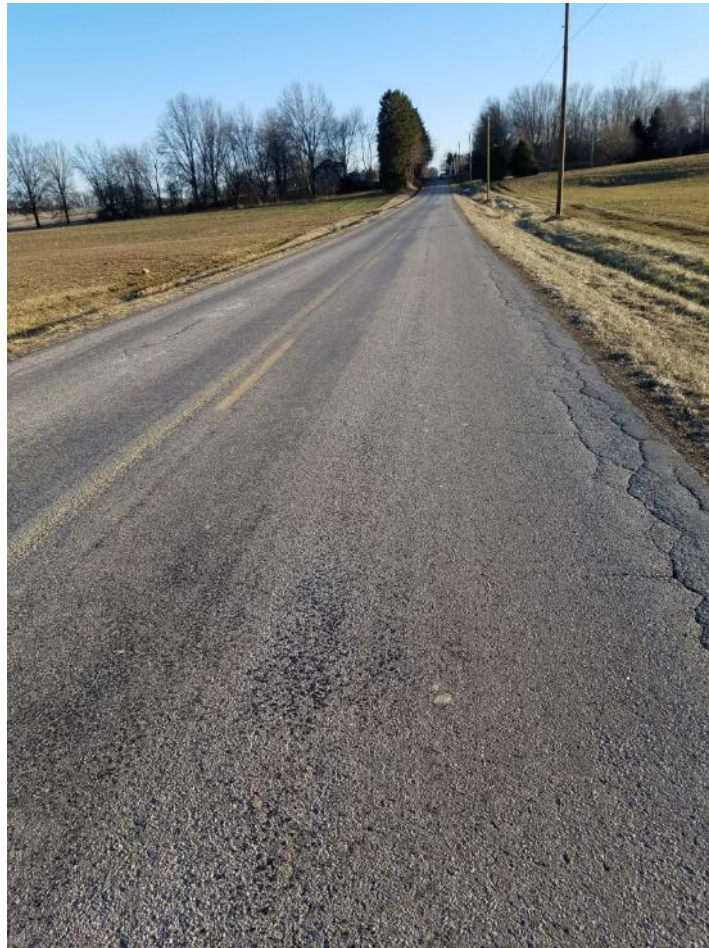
Chippewa between 5 Point Road and Smucker Road
